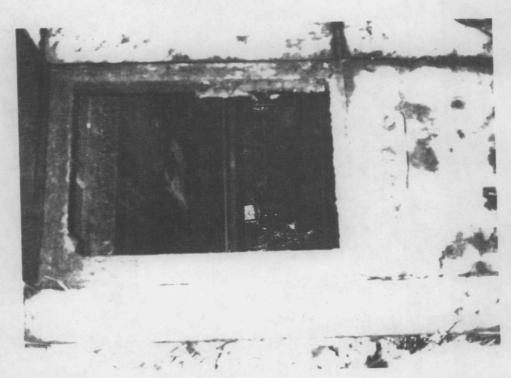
Location: SWMU 12 Orientation: Northwest
